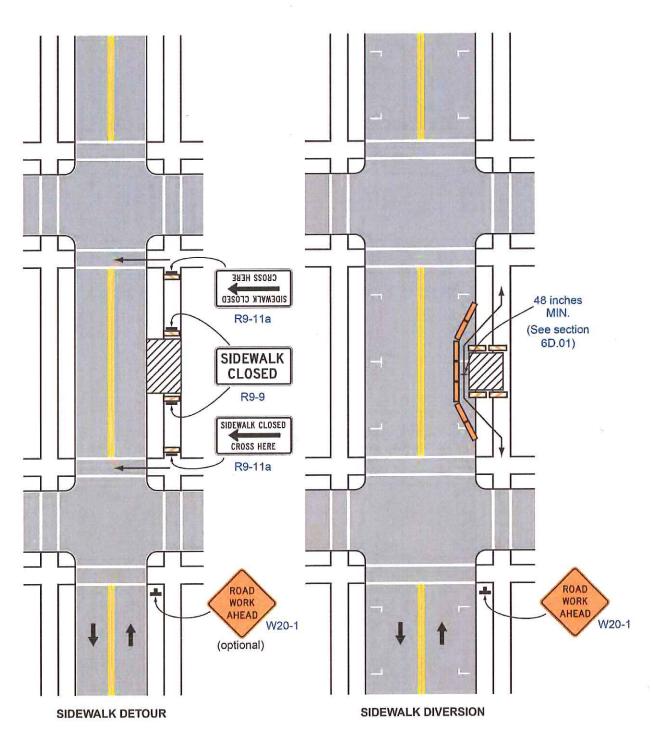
H-28. Sidewalk Detour or Diversion (TA-28)
